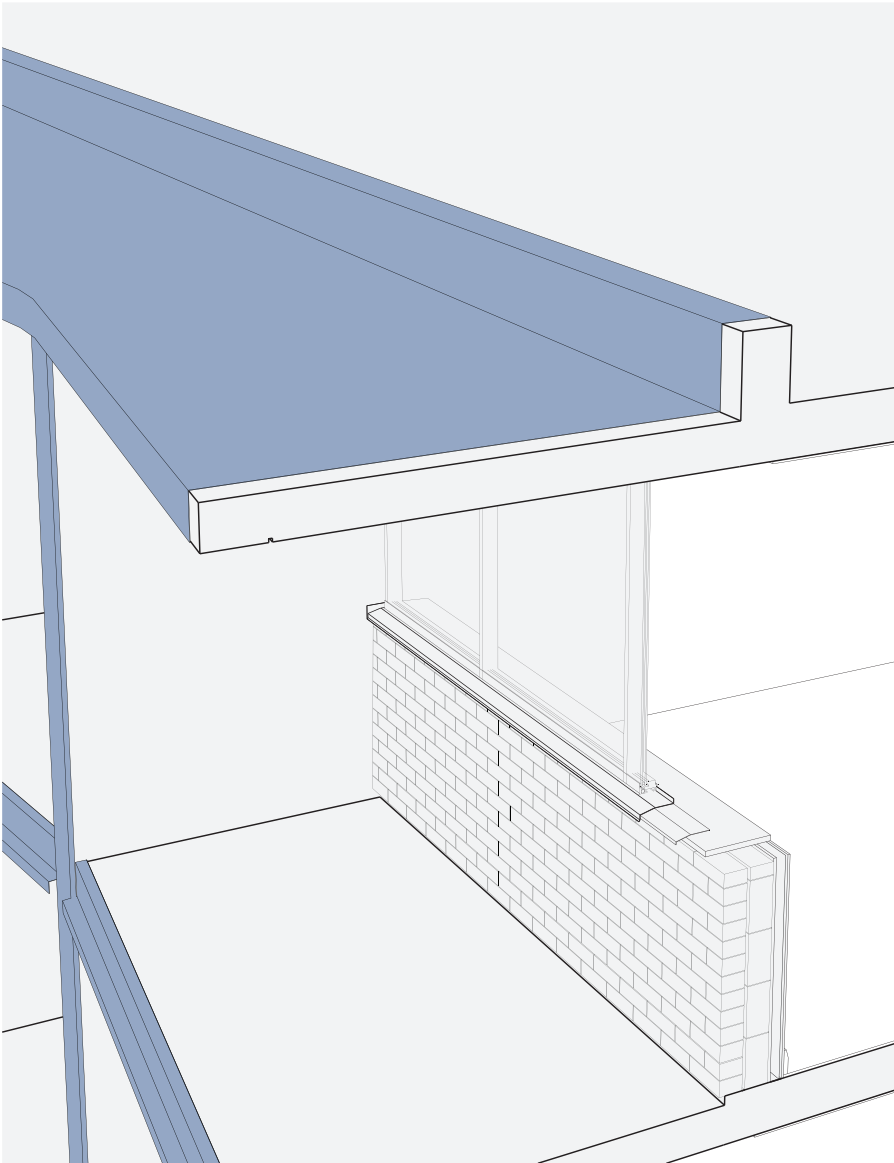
The balcony enclosure sequence is the same as described in earlier sections, hence the focus of this sequence will be the replacement roofing assembles. Following removal of the existing roofing, the replacement roofing begins with the applications of an air/vapour barrier that also serves as the waterproofing membrane. Refer to the previous sections for related notes.
